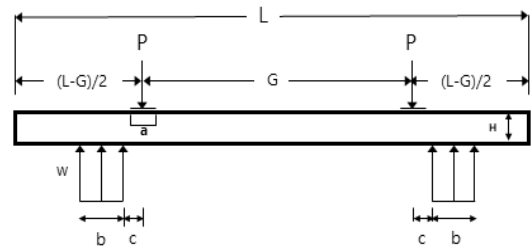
Calculation condition of ballastless steel plate girder sleeper
